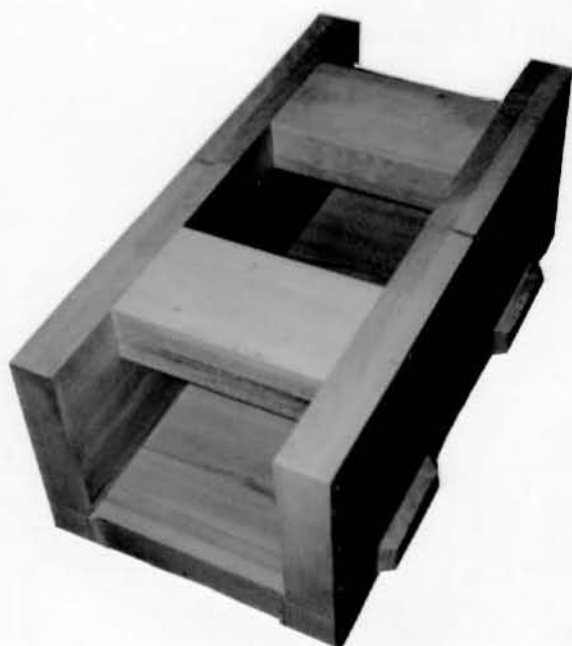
Prototype Scale Models of Hollow Concrete Elements
